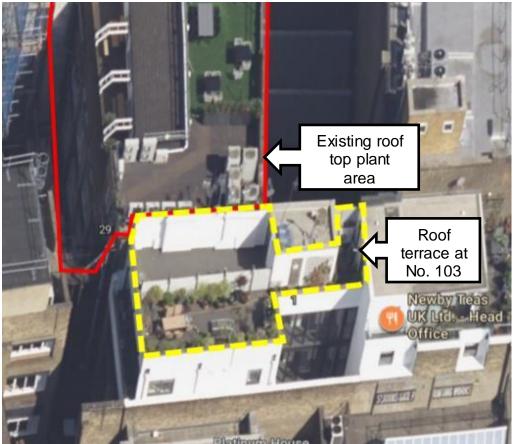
Rear of Site (outlined in red) in context with roof terrace at No. 103 St John Street shown outlined in yellow.
